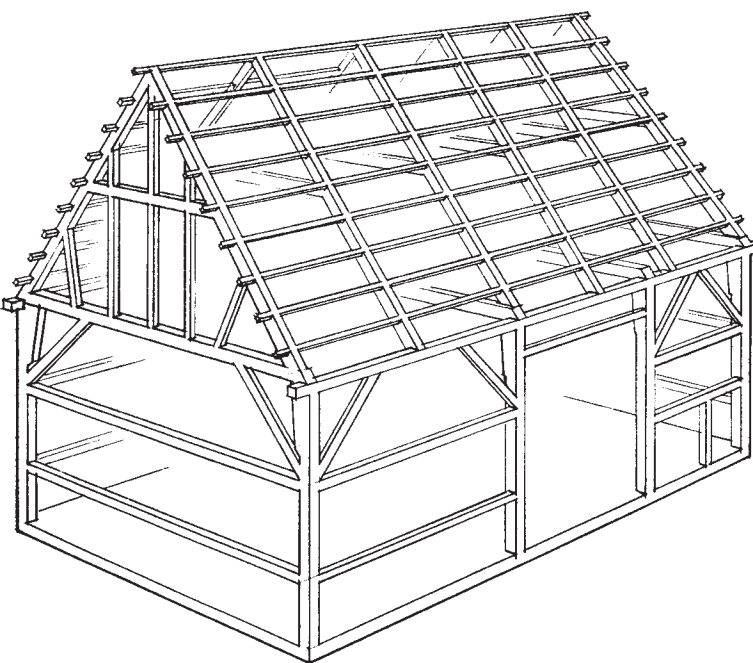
This 17th-century barn in Seekonk, Massachusetts, has principal rafters spaced a little over 6 ft. apart with 2x3 common purlins spaced about 2 ft. on center. The purlins extend past the gable to provide an overhang.
